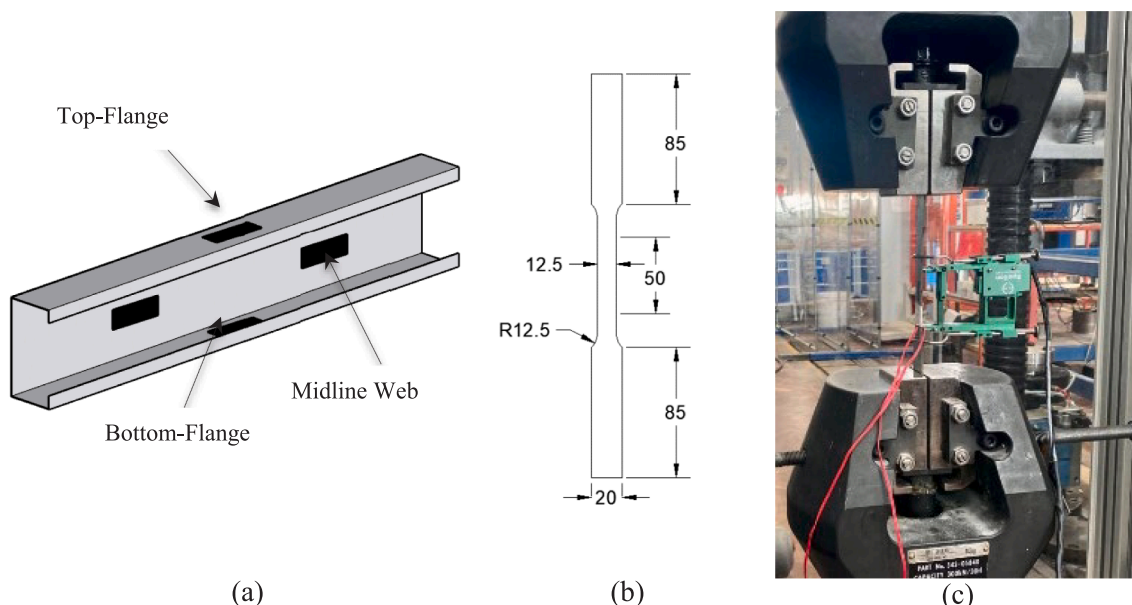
(a) Sampling locations of CFS tensile coupons, (b) dimensions of coupons (in mm) and (c) material test set-up.
